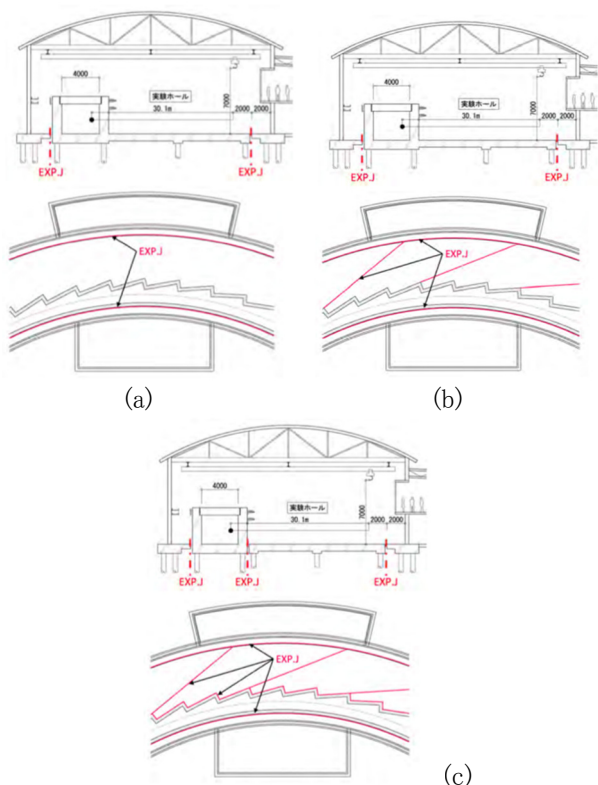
Three plans for the separation between ring tunnel floor and experimental hall floor.
